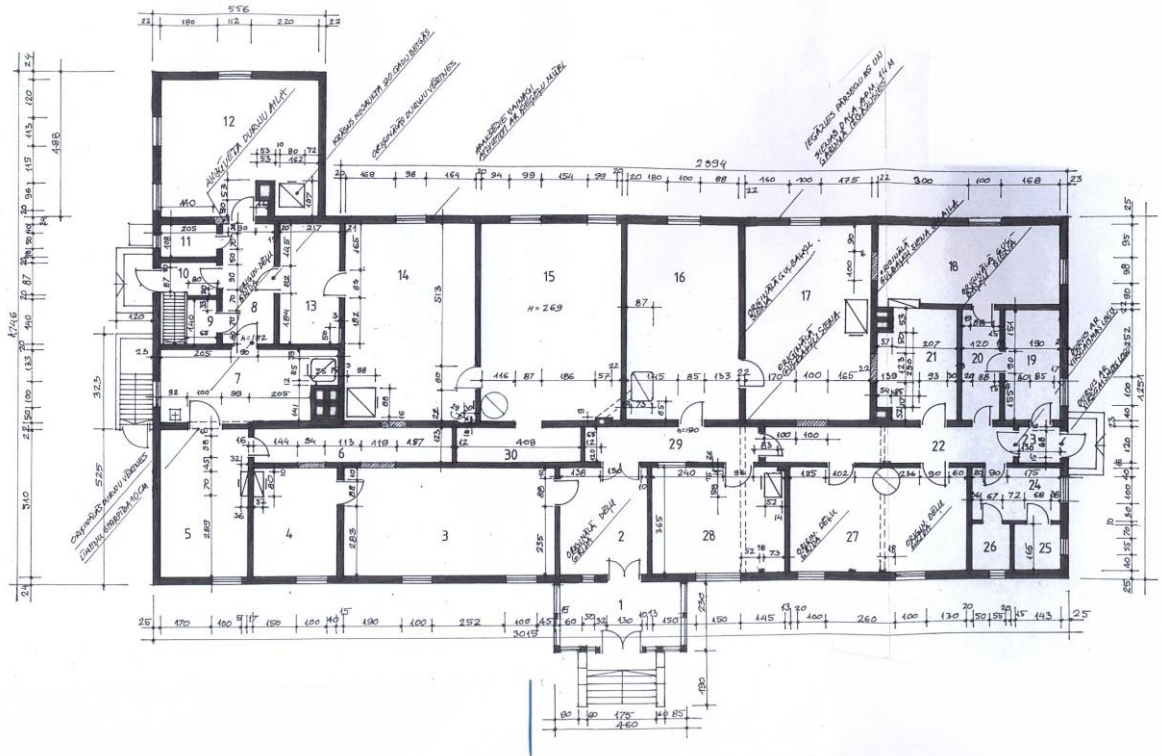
The layout of the first floor of the pastor's house [Source: drawing by author]
